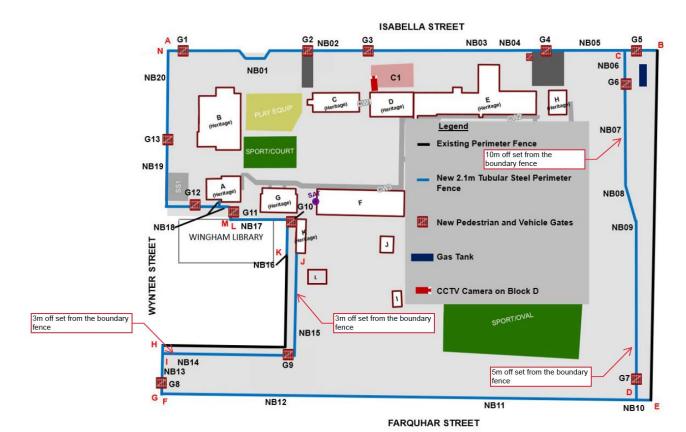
Extract of proposed site plan (NSW DoE, 2025)
